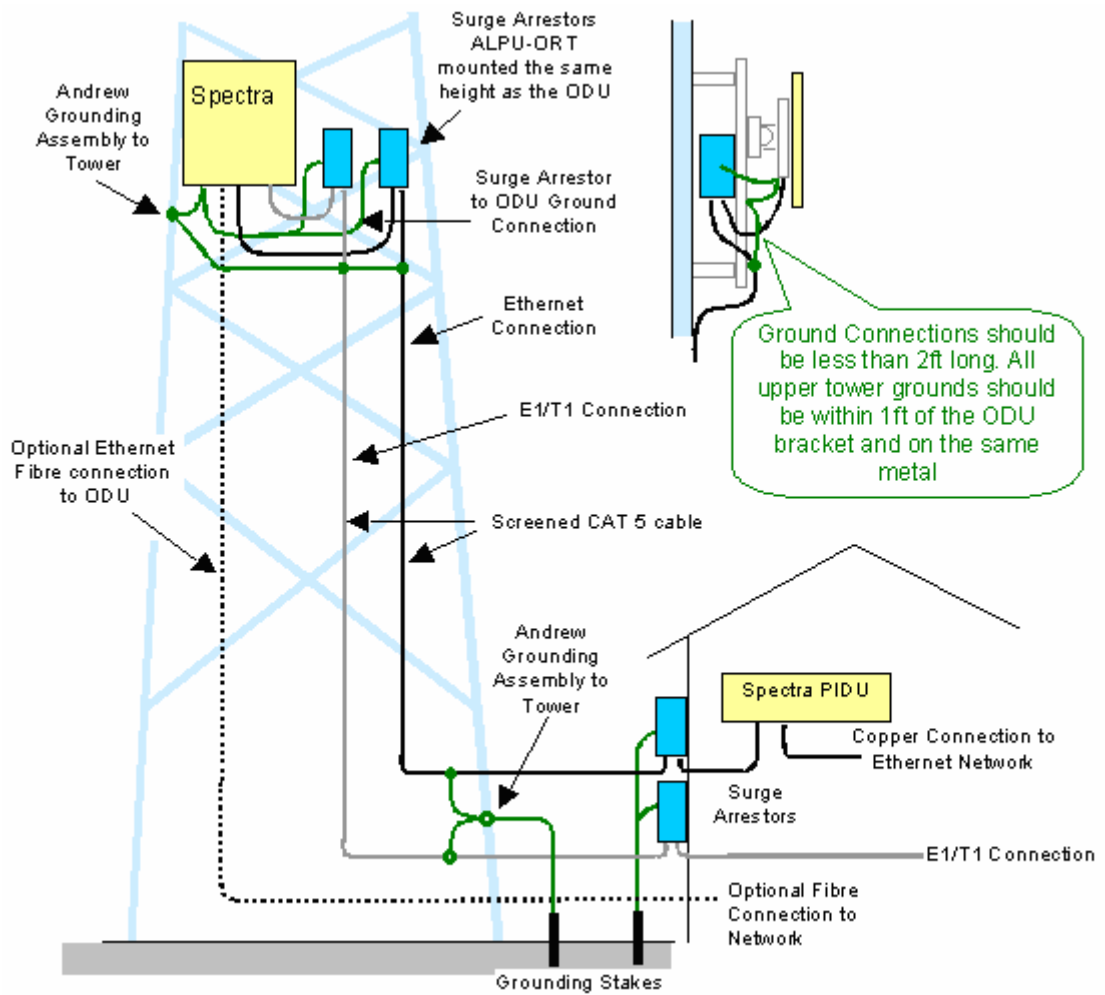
Typical Mast Installation with the addition of the E1-T1 cable
